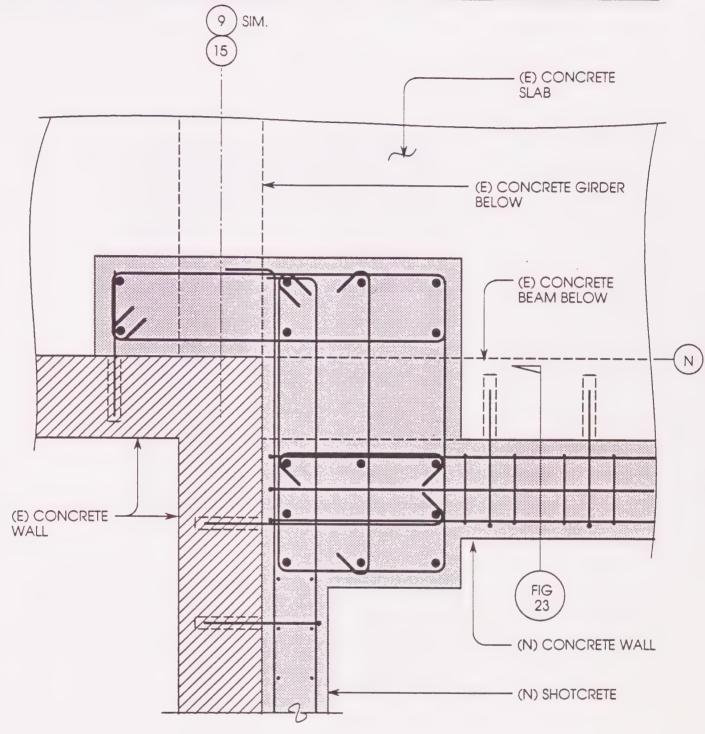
Retrofit Scheme - New Column at Ends of Elevator Wall
